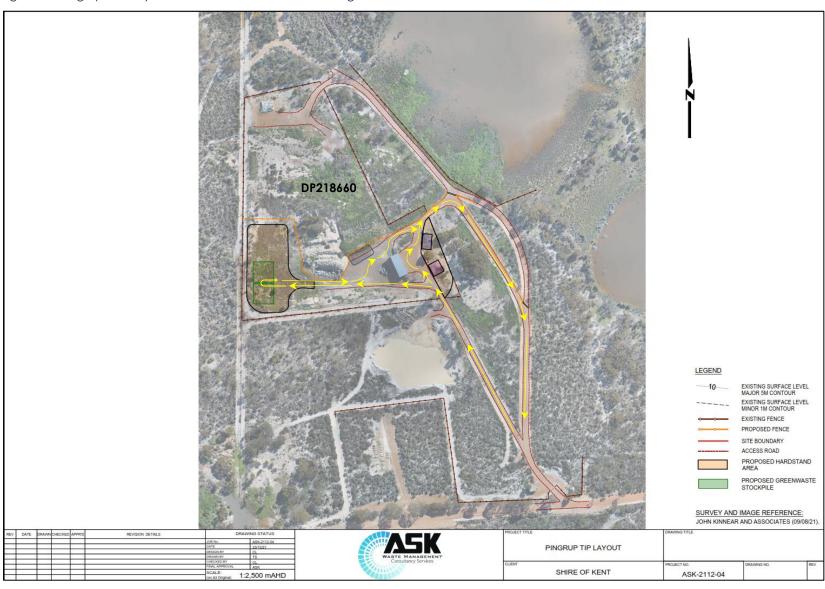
Pingrup Site Layout Plan – full site: traffic flow and gates
